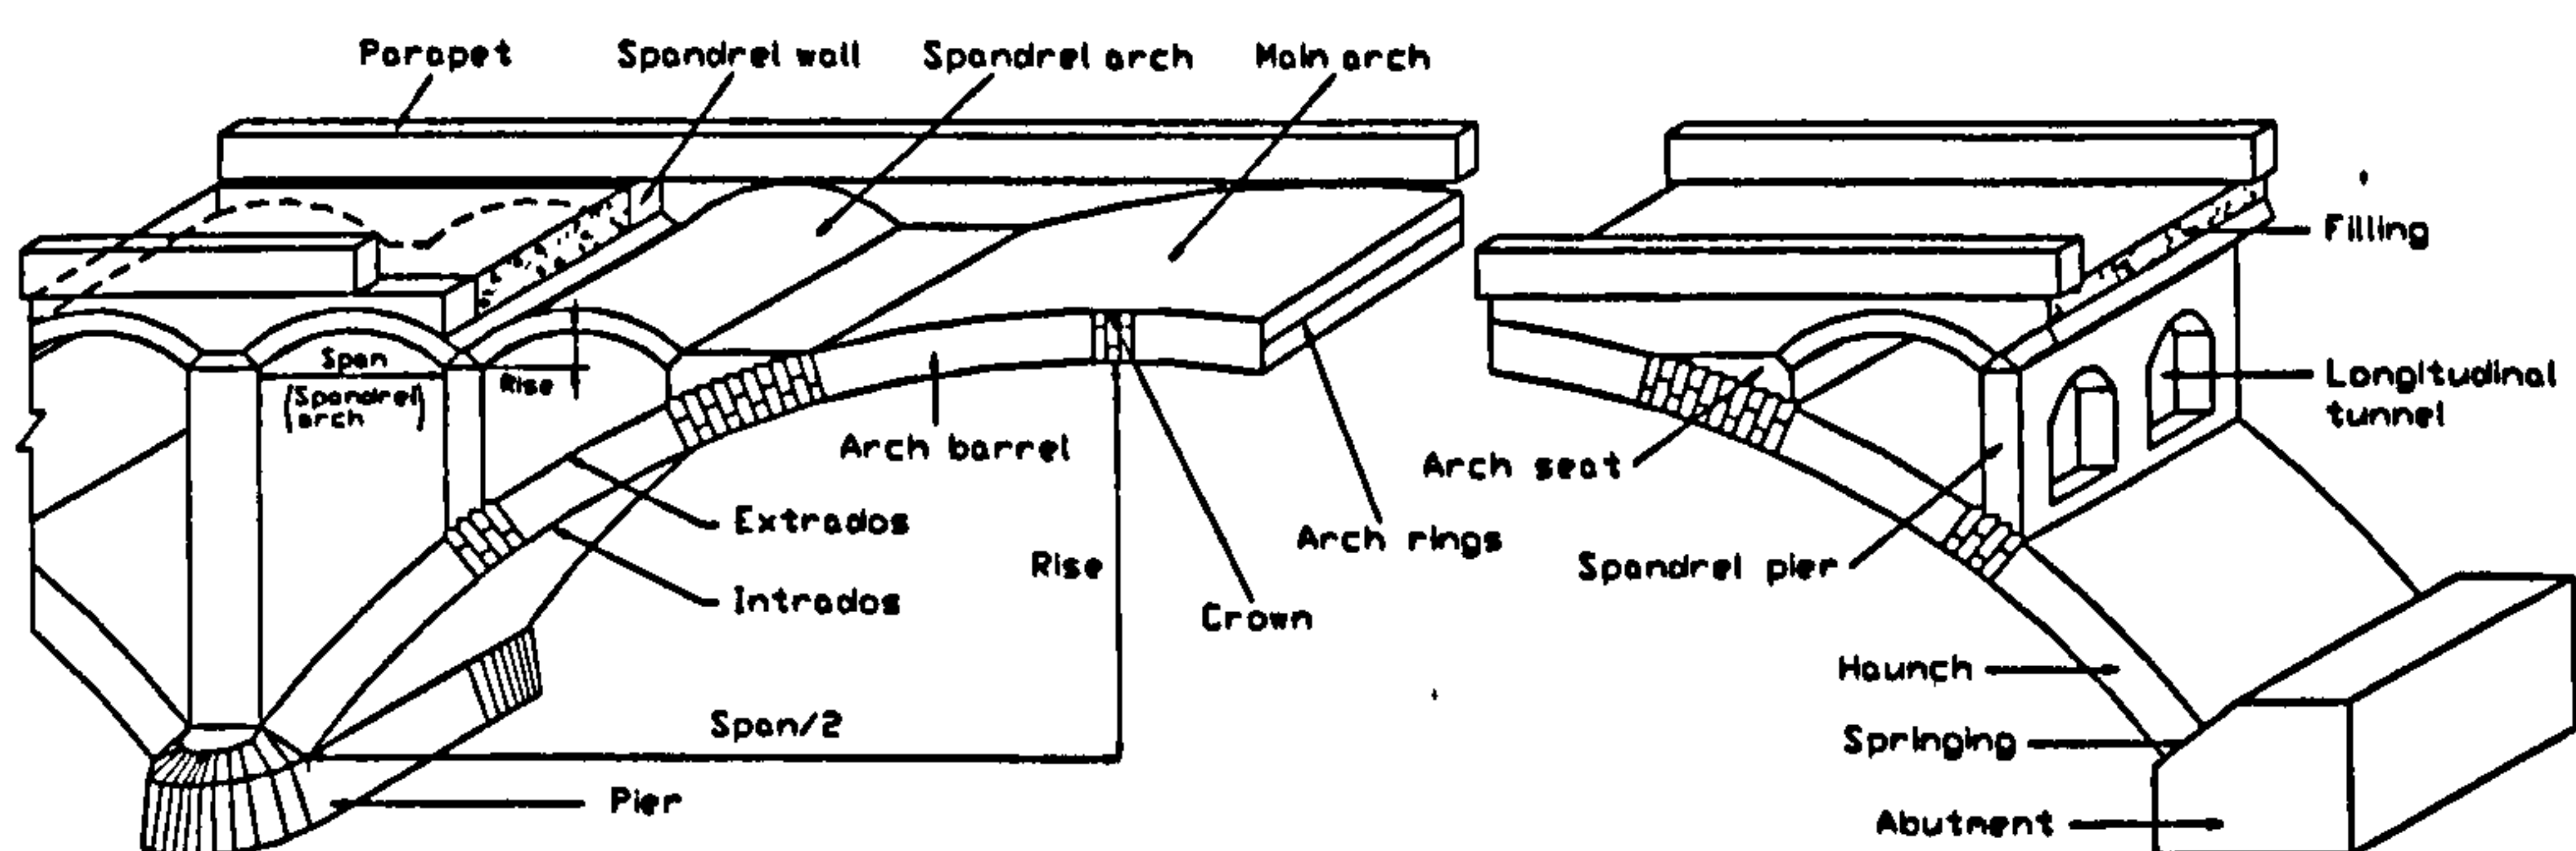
Open Spandrel Arch Bridge And Relevant Terms
